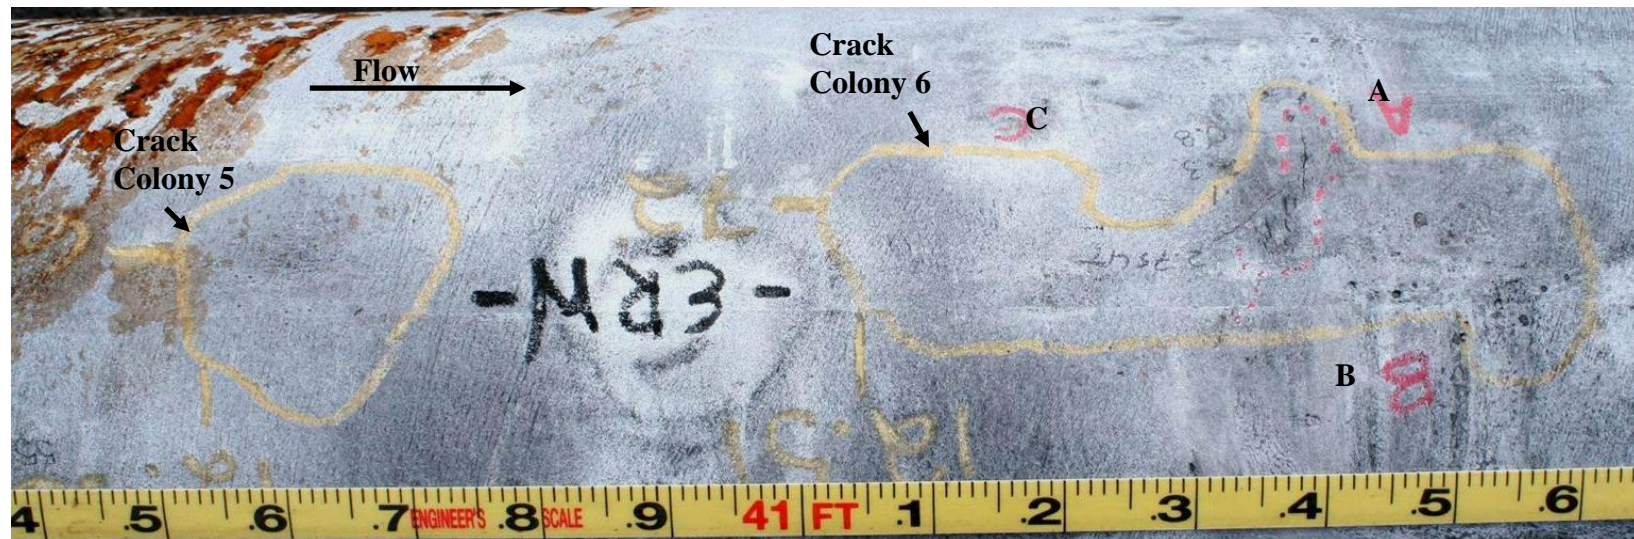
Photograph of the external pipe surface (prior to laboratory MPI) showing the crack colonies. The tape measure indicates the distance from the U/S girth weld.
